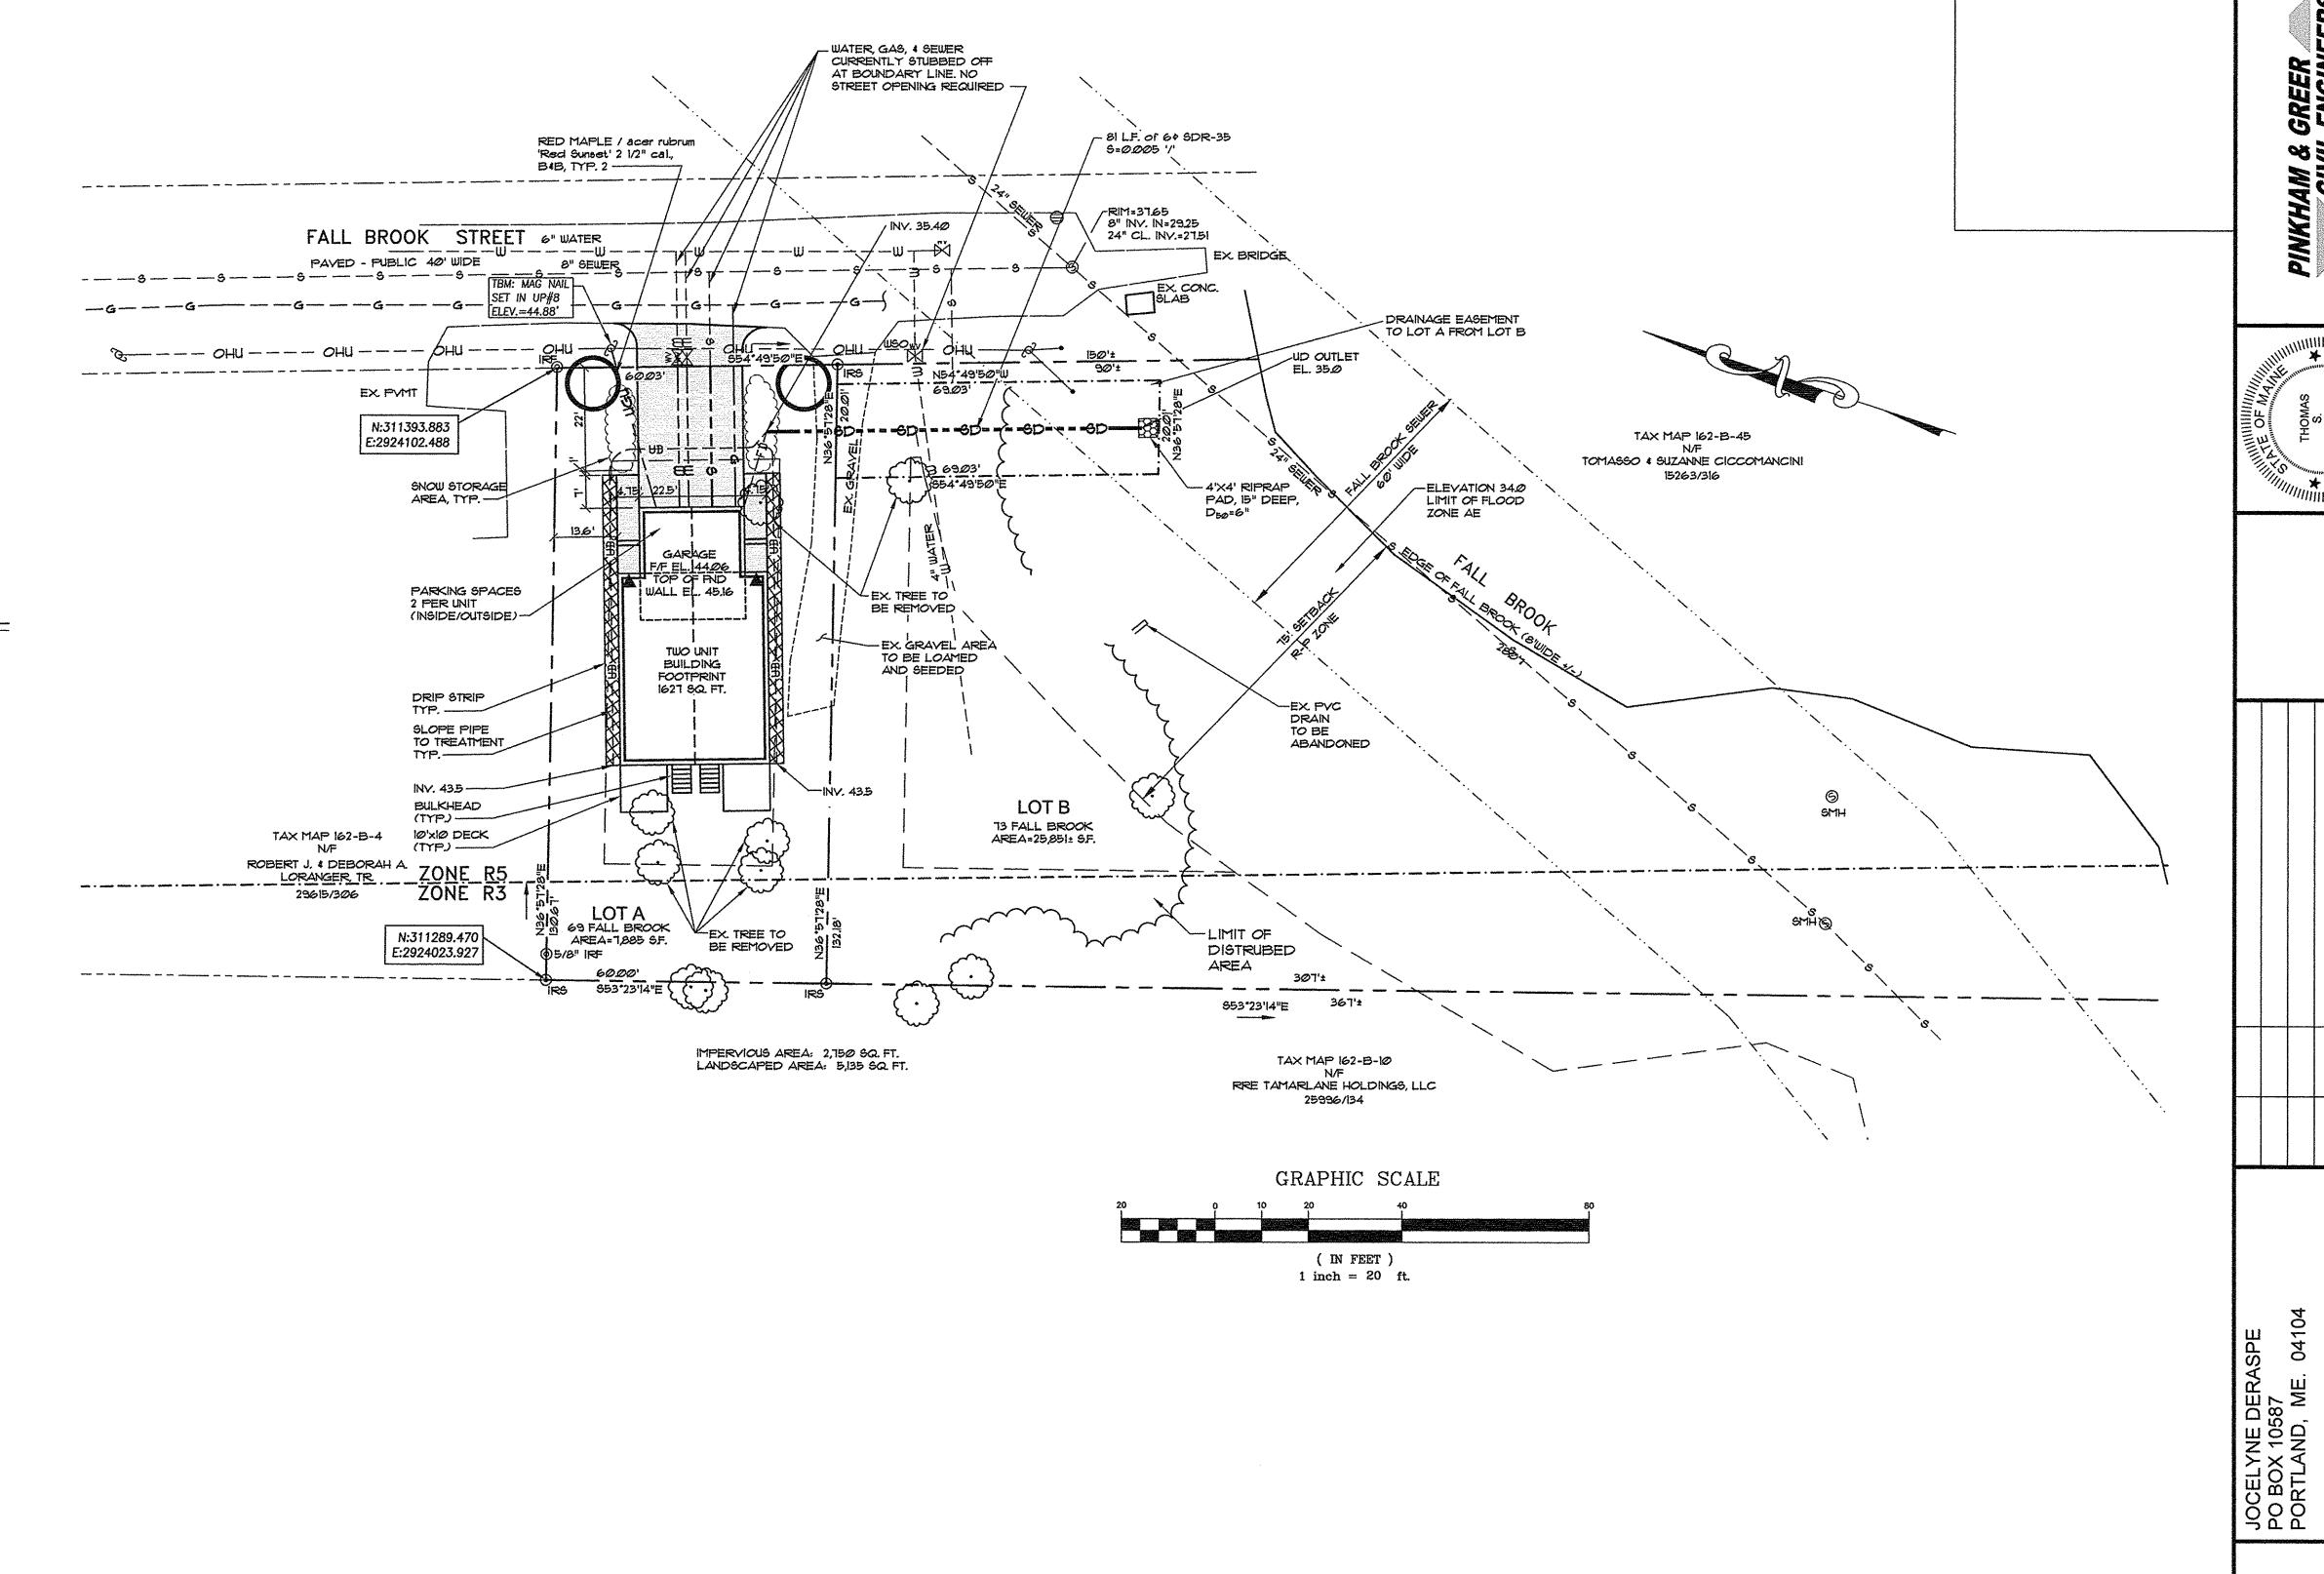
DETAILS BOUNDARY AND TOPOGRAPHIC SURVEY
